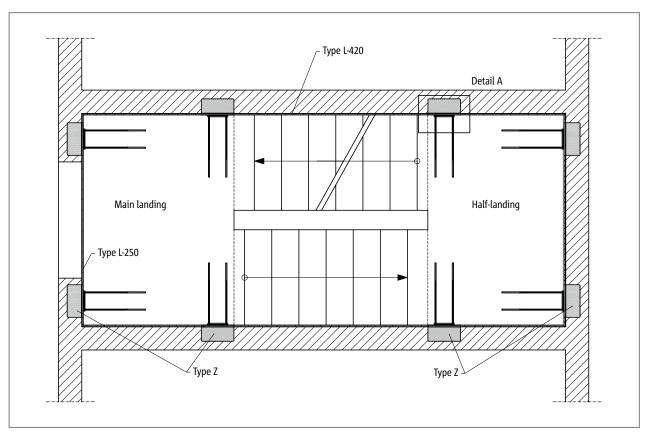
Schöck Tronsole® type Z: Alternative element configuration in plan view
